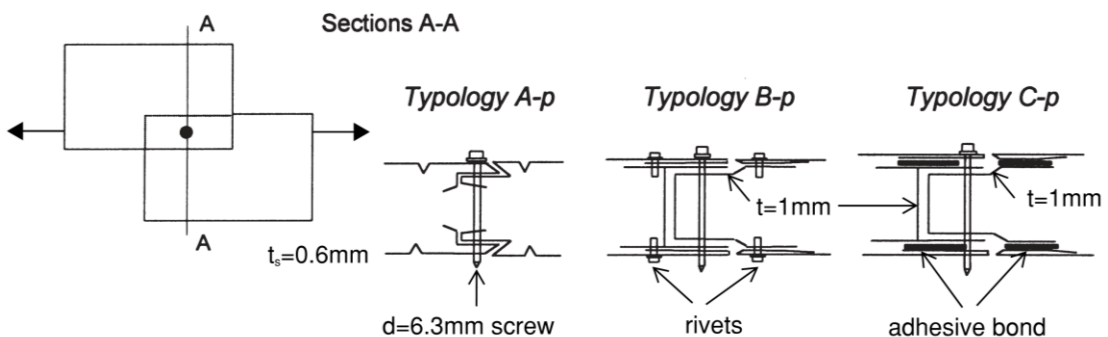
Examples of roof construction systems tested by Davies and Lawson (1999)
